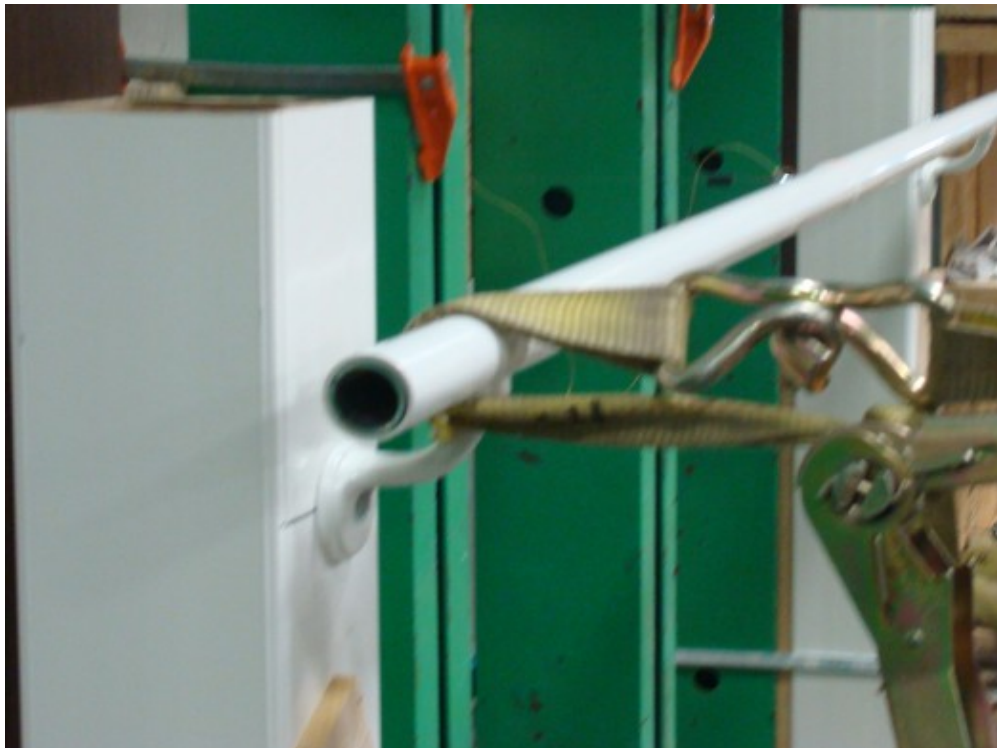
200 lbf Load Applied – Horizontal Support
